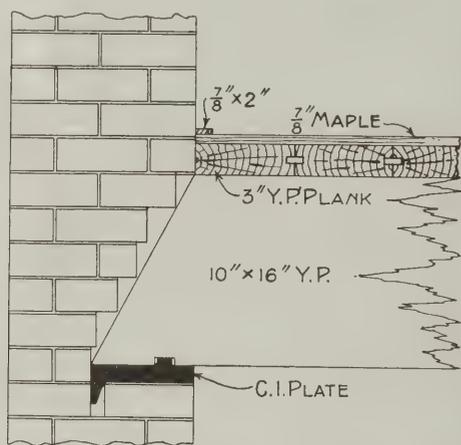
Anchorage and Fire Cut of Beam at a Wall
